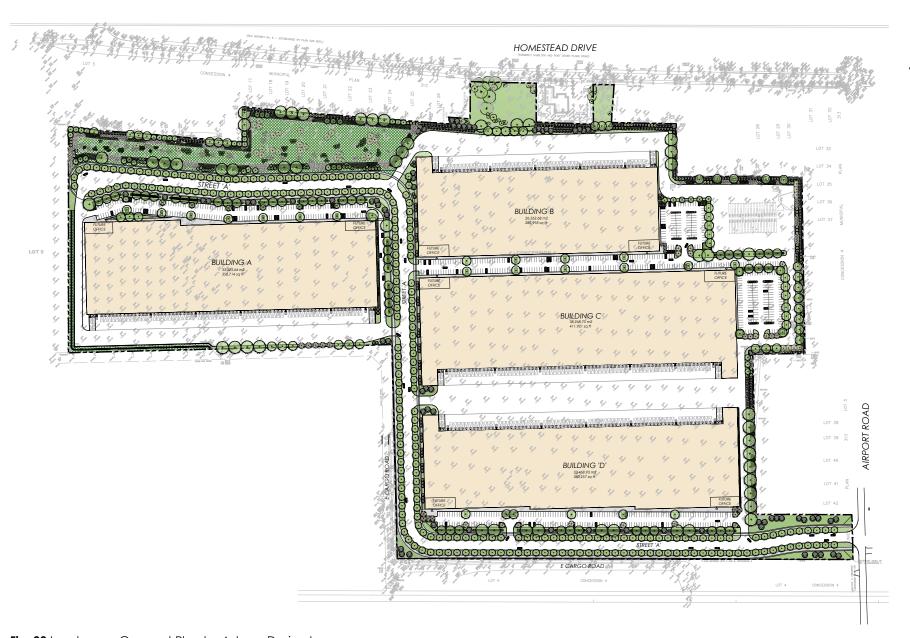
Landscape Concept Plan by Adesso Design Inc.
